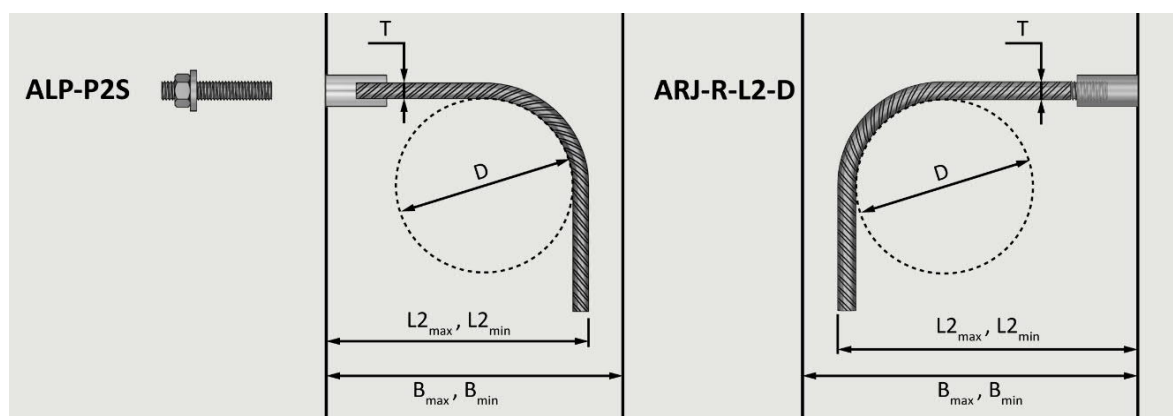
ALP-P2S bolt and ARJ-R rebar coupler bending dimensions
